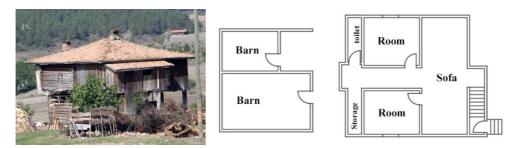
Alıç Highland Dwelling (Türk, 2017), ground floor and first floor plan (drawn by the author)
